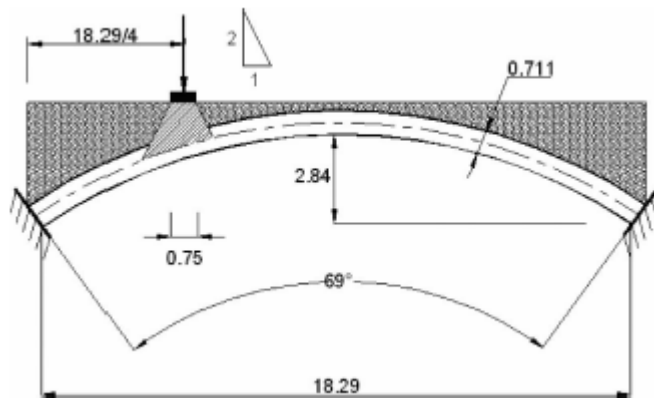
Bridgemill bridge geometry with an axle width of 0.75 meters (Meli, 2009)
